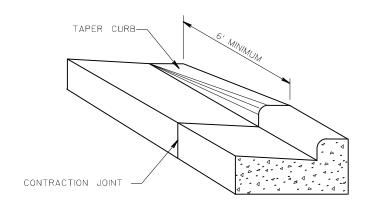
DETAIL OF CURB AND GUTTER AT INLETS (INLET 2X3-H SHOWN)
